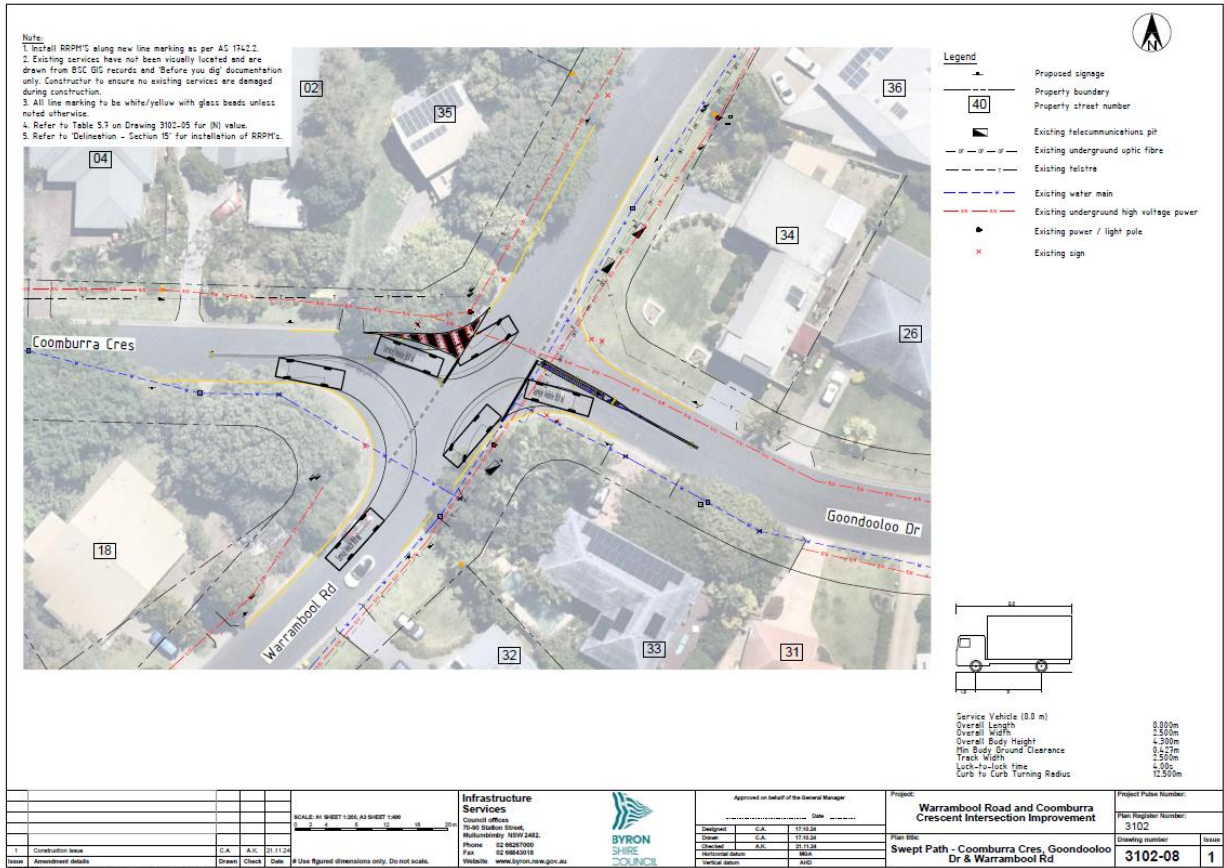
new proposed intersection layout (sheet 4 of 4)
